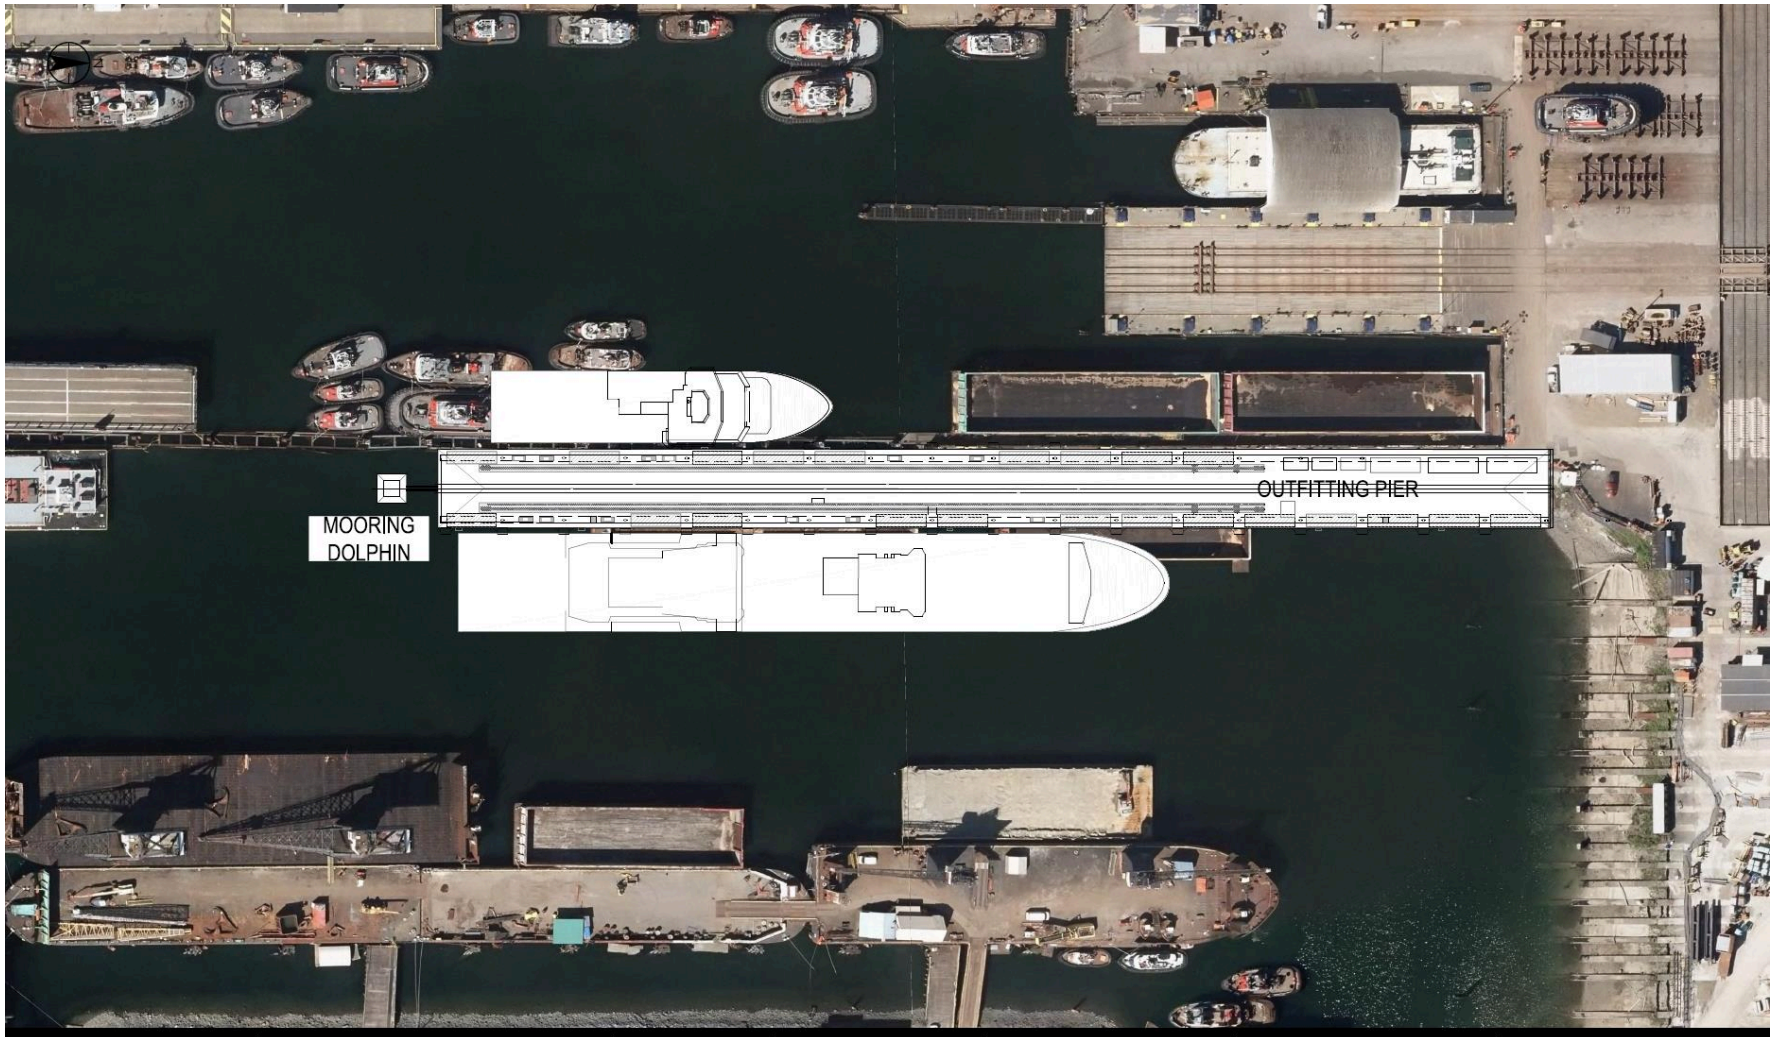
Seaspan Vancouver Shipyard Proposed Outfitting Pier Site Plan
